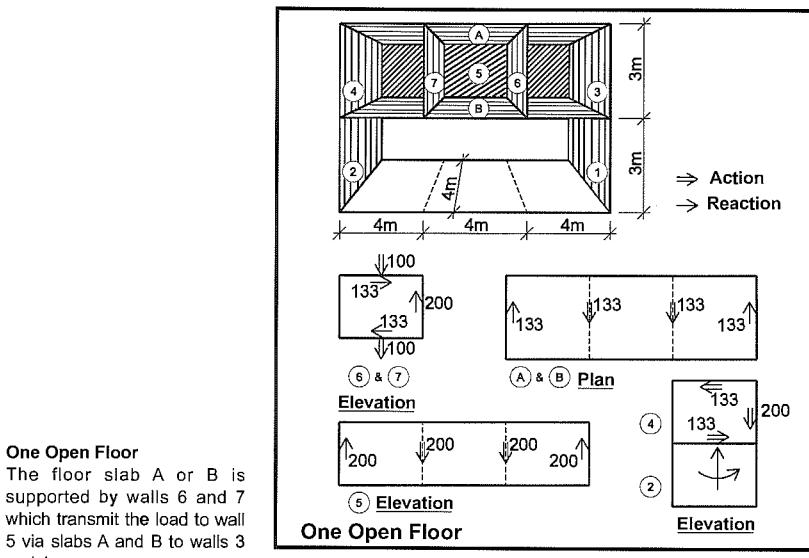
Horizontal And Vertical Load Transfer Of Determinate Discontinuous Slab-Wall System
